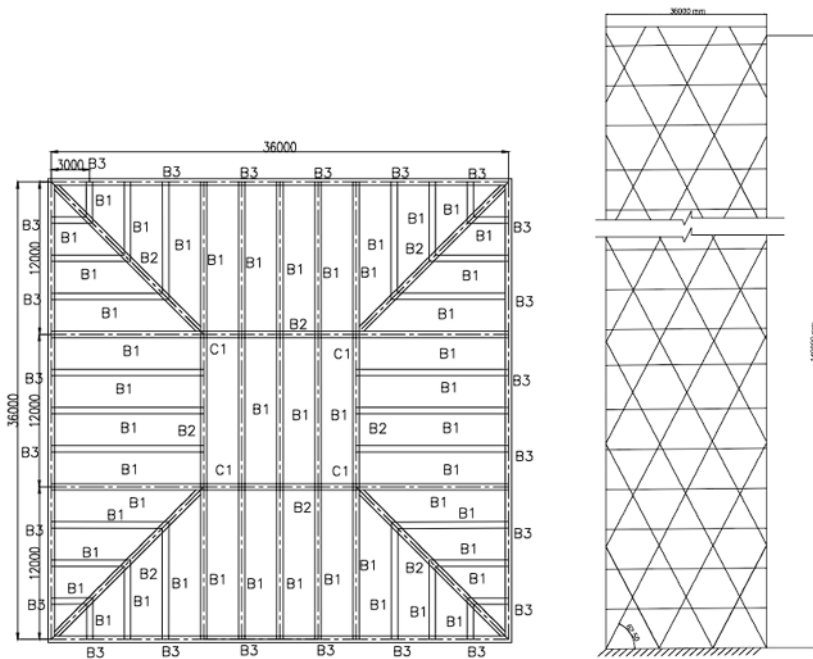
(a) Floor Plan & (b) Elevation of 36-Storey Diagrid Structure
